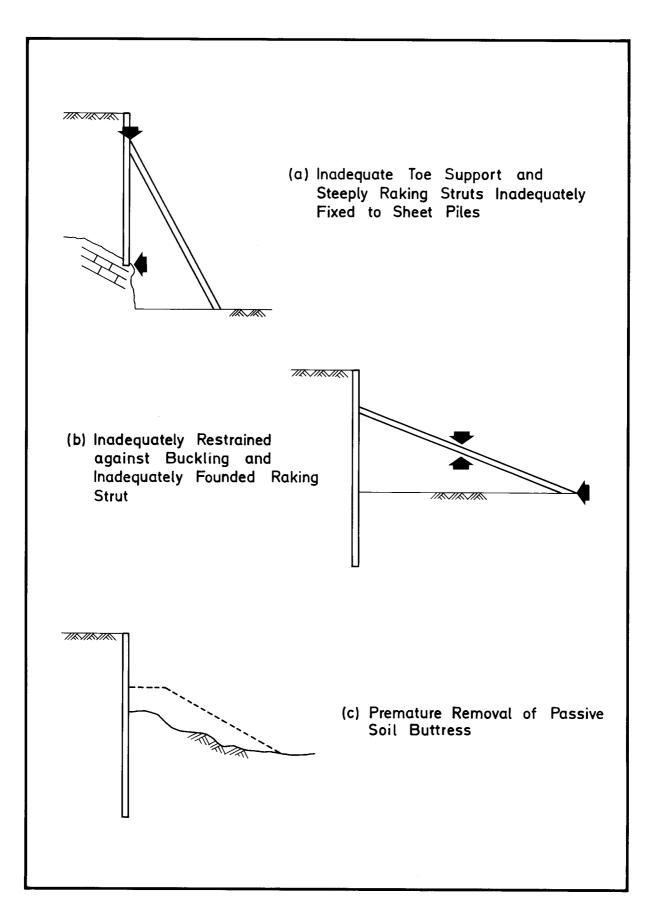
Factors Causing Collapse of Sheet Pile Walls (after Malone, 1982)
